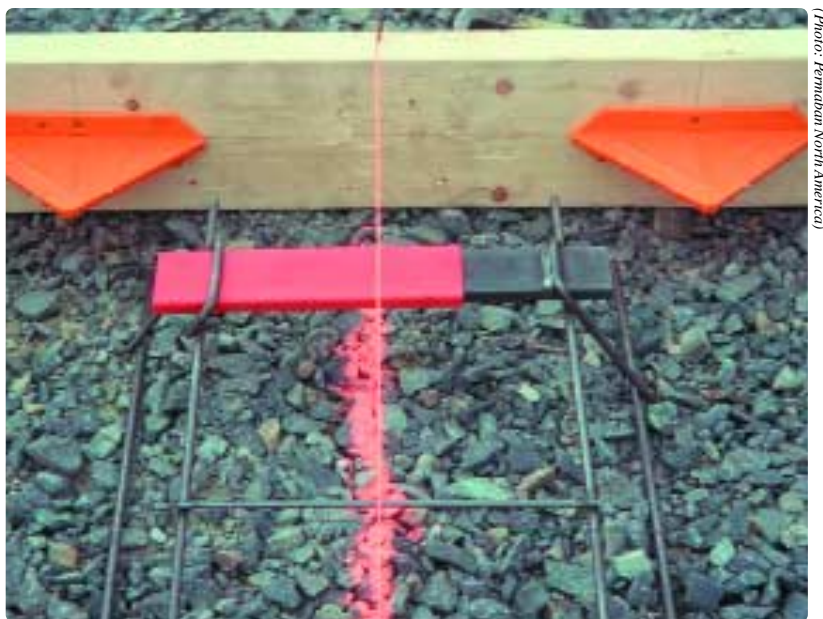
Rectangular plate dowel basket used with diamond dowels at formed joints.
